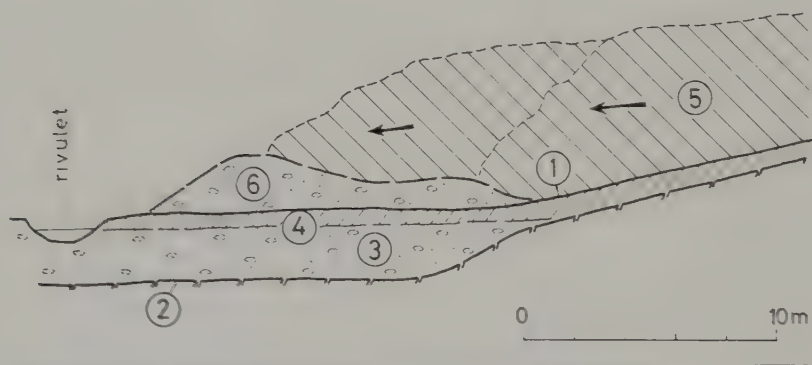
Schematic cross-section of a drainage and buttress fill dumped in front of the face of a sliding mass; 1 — original ground surface, 2 — bedrock, 3 — gravel terrace, 4 — surface soil, 5 — toe of the landslide, 6 — drainage fill.
